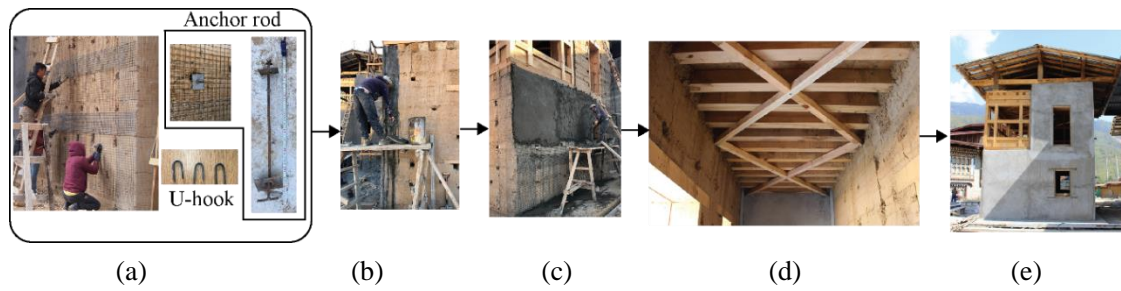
Retrofitting work process: (a) Placement and anchorage of mesh, (b) Application of cement slurry as pretreatment, (c) Cement plastering, (d) Wooden brace for floor rigidity, (e) Final specimen after retrofitting
